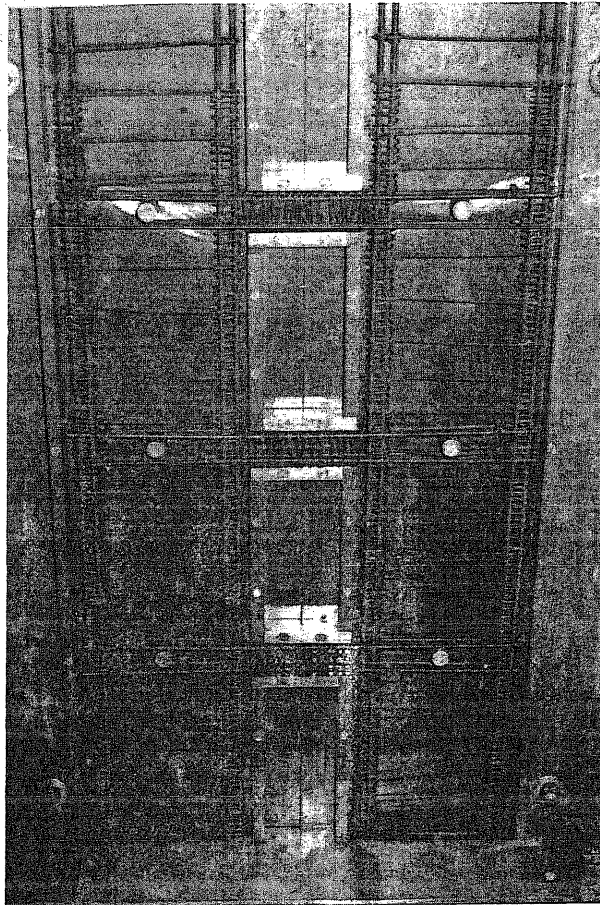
Beam and Wall Reinforcement (Frame M)
